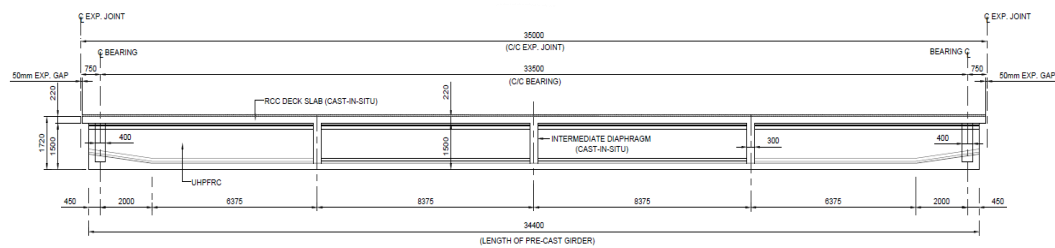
29 Elevation of 35m span UHPFRC post tensioned I girder
